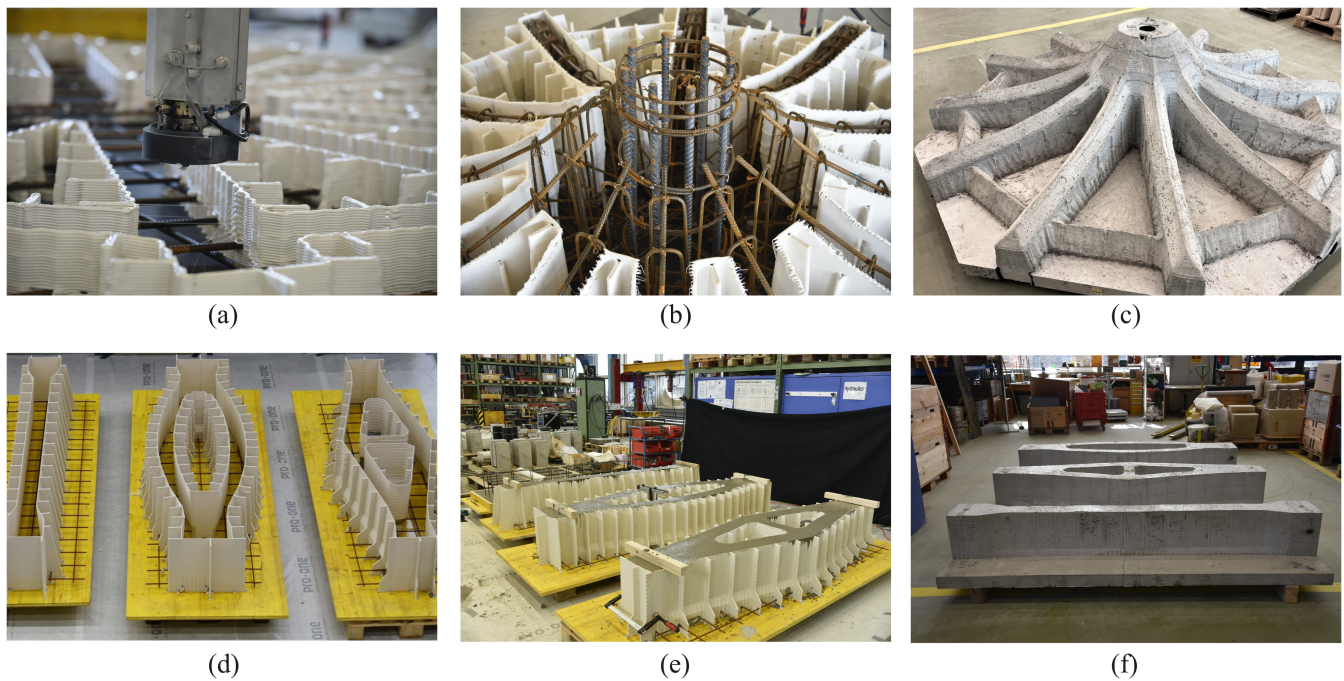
Specimen production (upside down): (a)–(c) slab-to-column transition, showing formwork printing with stiffeners; reinforcement cage integration and specimen after demoulding, respectively; and (d)–(f) ribs, showing printed formwork with stiffeners before and after casting, and after demoulding, respectively.
